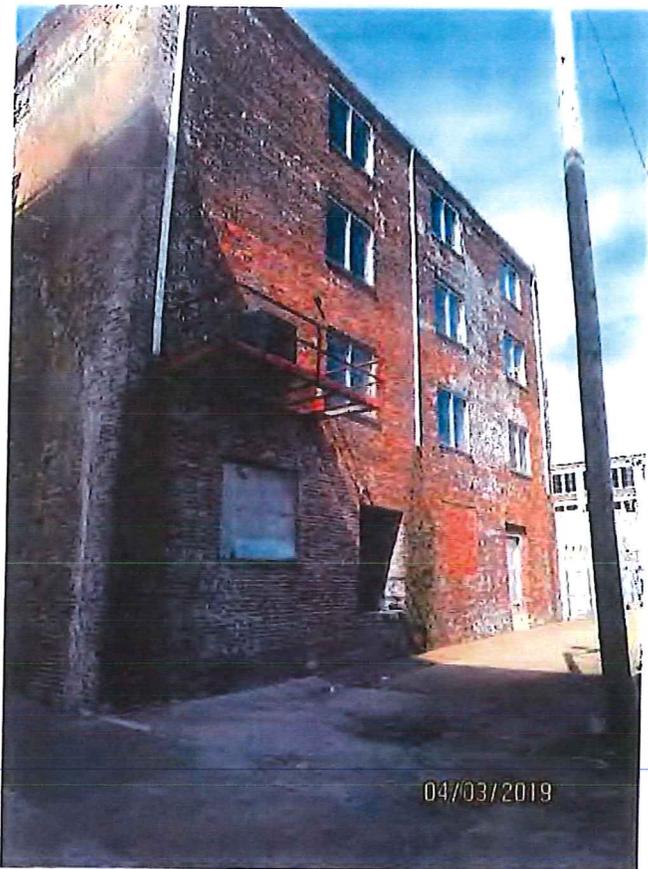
Masonry cracks at right sidewall.
